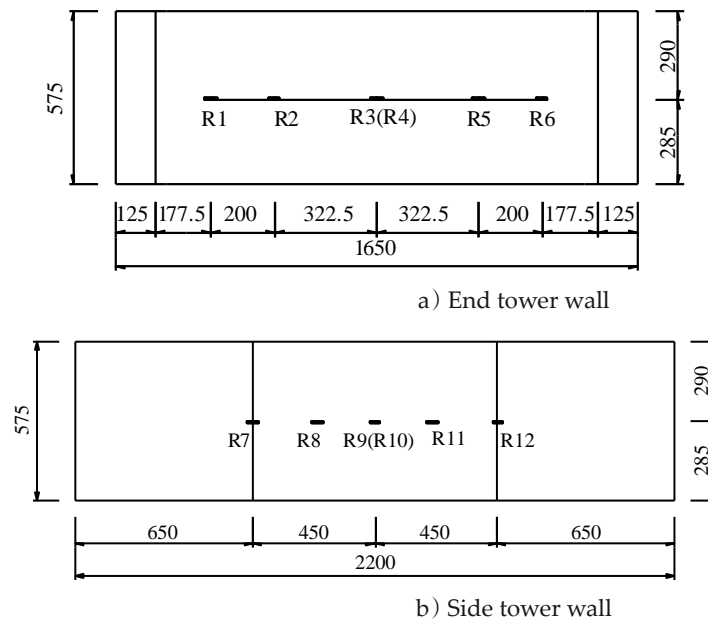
Reinforcement strain measurement scheme (unit: mm)
